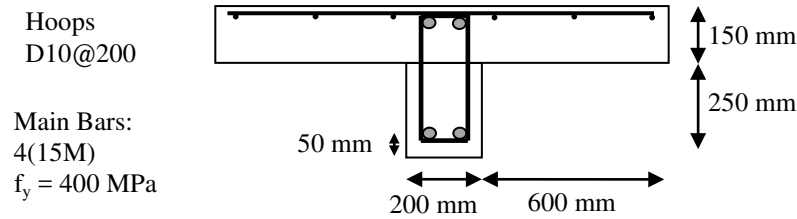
Cross Section of Beams in the Secondary Frames.
